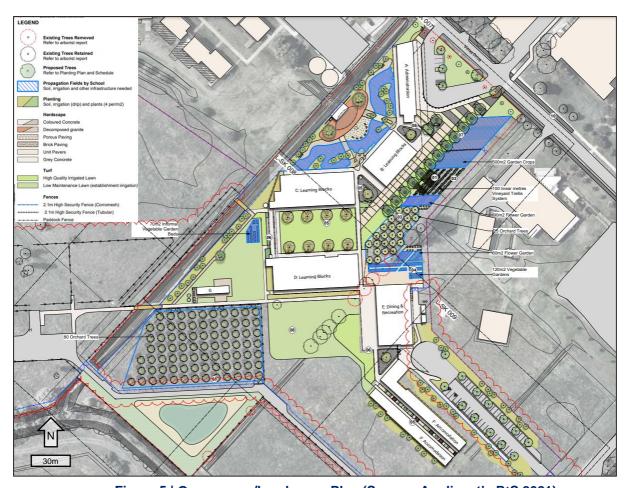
| Open space/Landscape Plan (Source: Applicant's RtS 2021)
